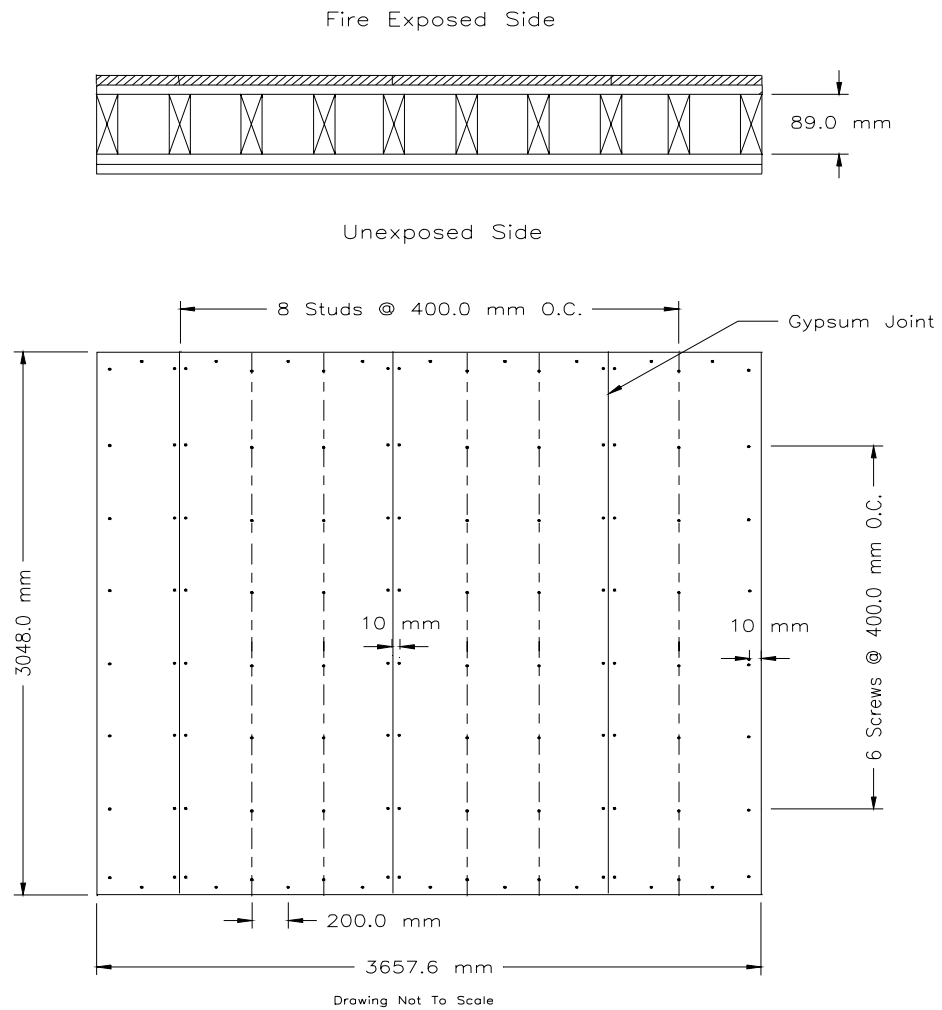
Screw Locations For Wood Stud, 2x2 Gypsum Board Layers, Full-Scale Assembly (Face Layer, Fire Exposed Side)
